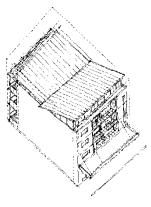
Roof design - Roof forms must be contained within the building envelope.
